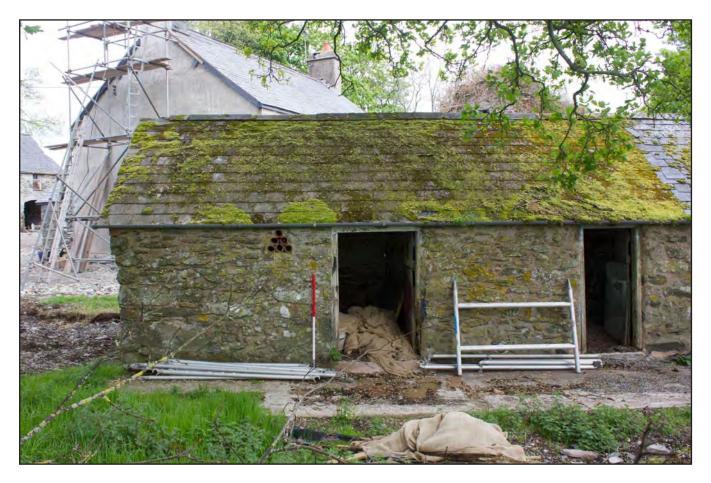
Southwest elevation (left) of Building 3 - Pigsties at Gaer Gerrig, Llangwm, Conwy - from the southwest - 1.00m scale
